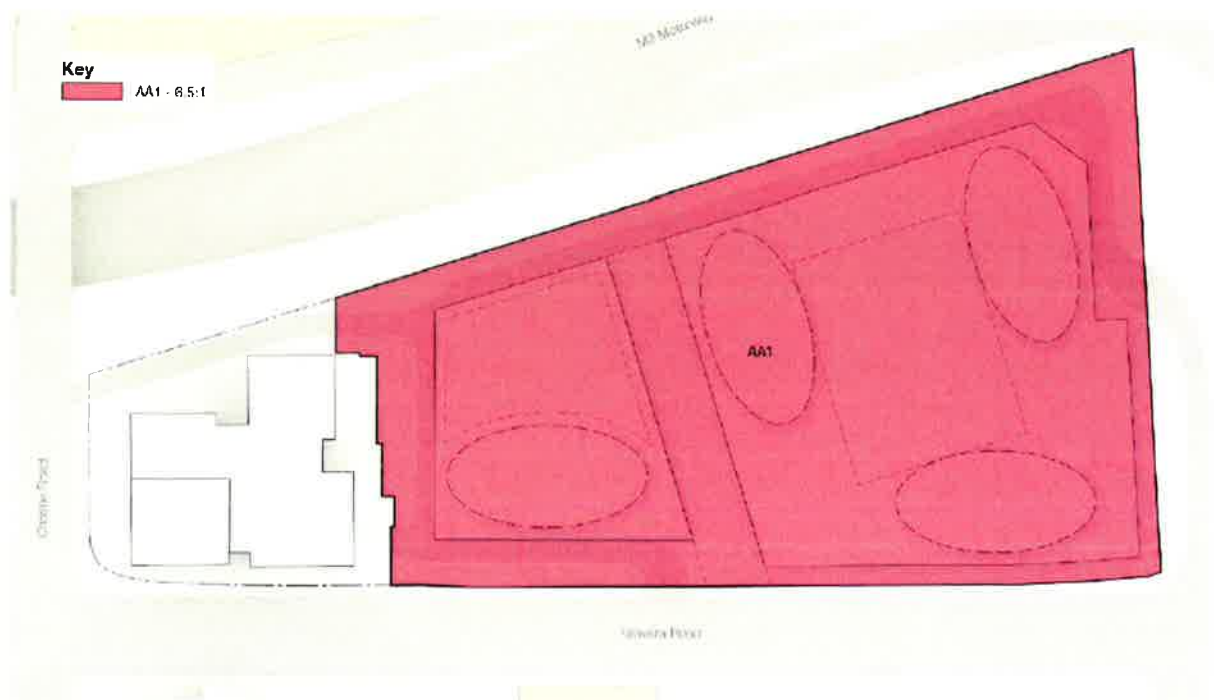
Extract from planning proposal depicting proposed floor space ratio map.
